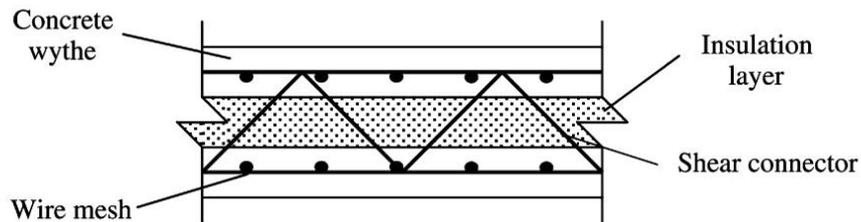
Precast Concrete Sandwich Panel – (Benayoune, 2008)
